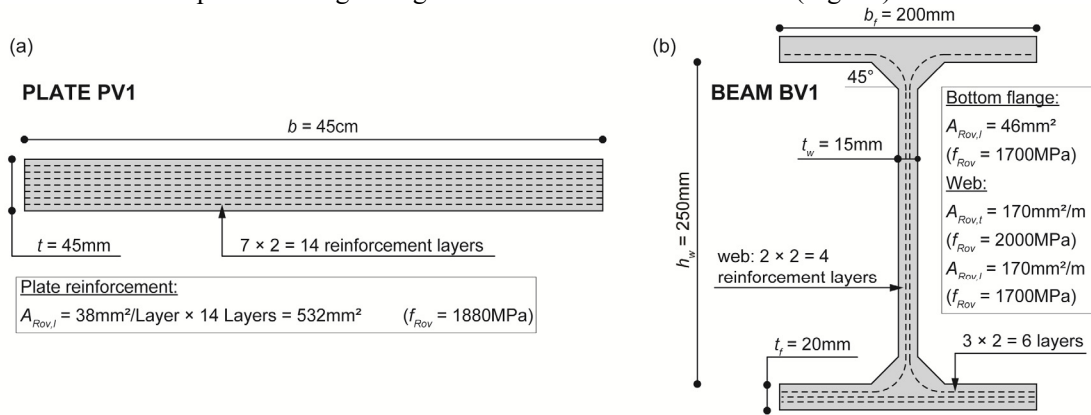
Cross section and reinforcement layout of the tested members: a) plate element, b) beam.
